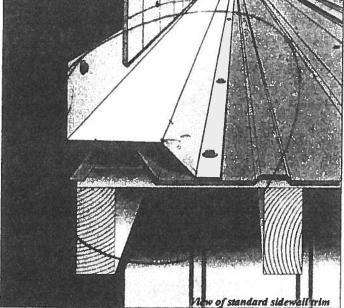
Sidewall flashing is applied when the side of the roof butts up against an adjacent wall. The wall-side of the flashing can either be covered over with siding or sealed with counterflashing. Butyl tape should be applied where the "foot" of the flashing attaches to the roof, and, if used, along the top edge of the counterflashing.
